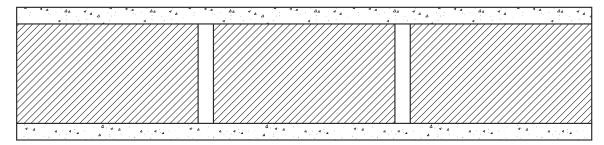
C4g: 110 mm thick brick masonry with 13 mm cement render on each face
